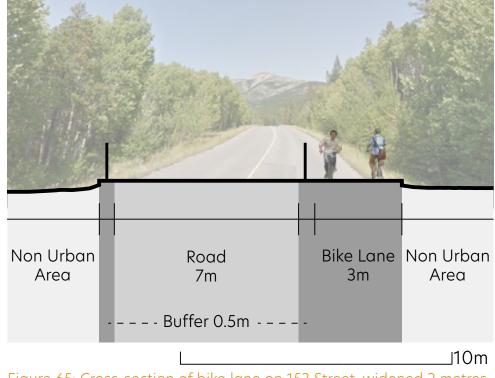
Cross-section of bike lane on 153 Street, widened 2 metres
